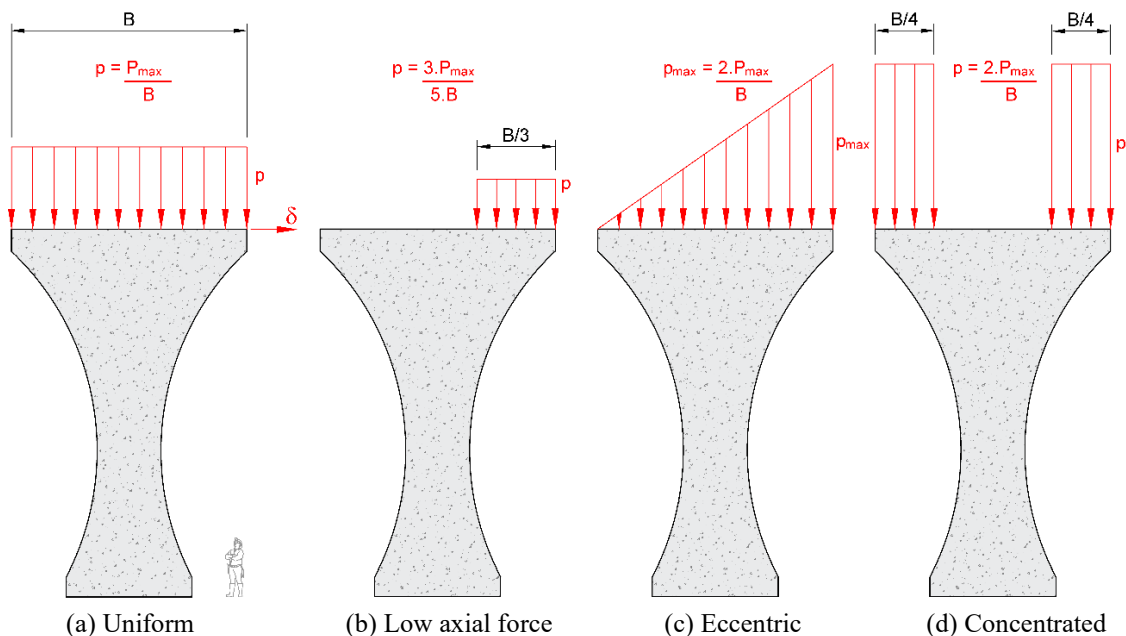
Design loading scenarios developed for the permanent reinforced concrete pillars.
